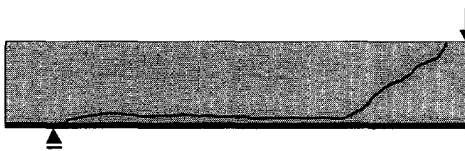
Shear failure by a flexural shear crack in unreinforced beam C5 plated in flexure (l'Hermite and Bresson [1967a]¹)
